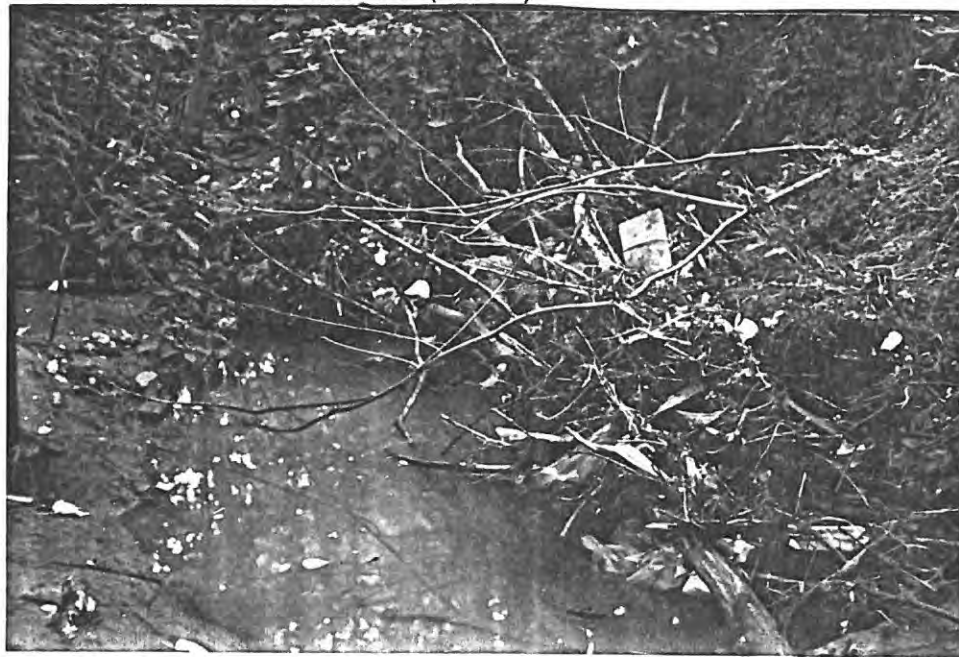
Weems Creek at Outfall of 60" RCP at U.S. Rte. 50 and MD. Rte 450 Ramps (Pt. C)
